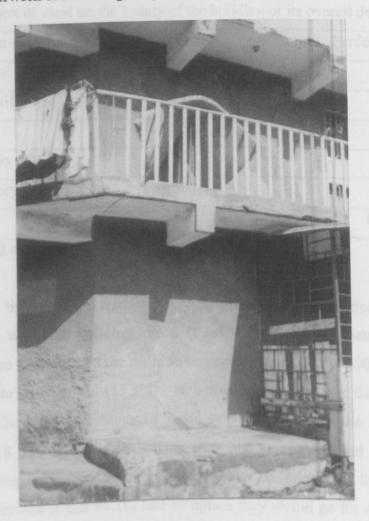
Cracks which appears at the ground floor and the first floor as shown have been plastered, hence the non-uniformity of the rendering. As told this cracks are always plastered after every 3 months, because they keep on recurring.
